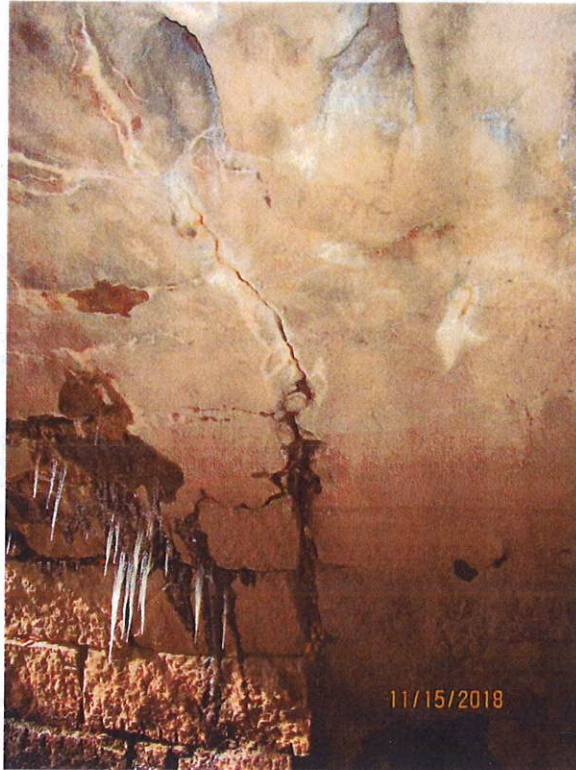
Arch/Arch Ring - 7ft north of south fascia from west spring line: Void between arch sections with the south edge lower than the north. Also note full arch crack in shotcrete with efflorescence and rust
